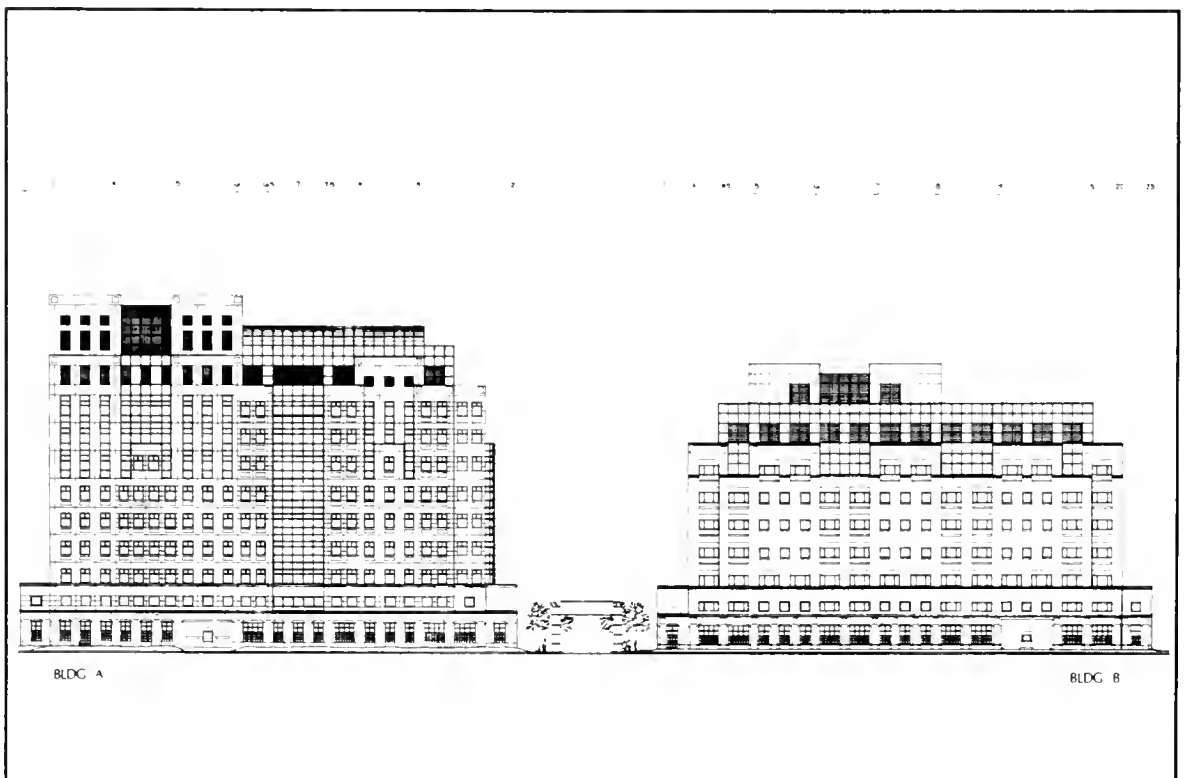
Proposed Project : South Elevation (Buildings A and B)
